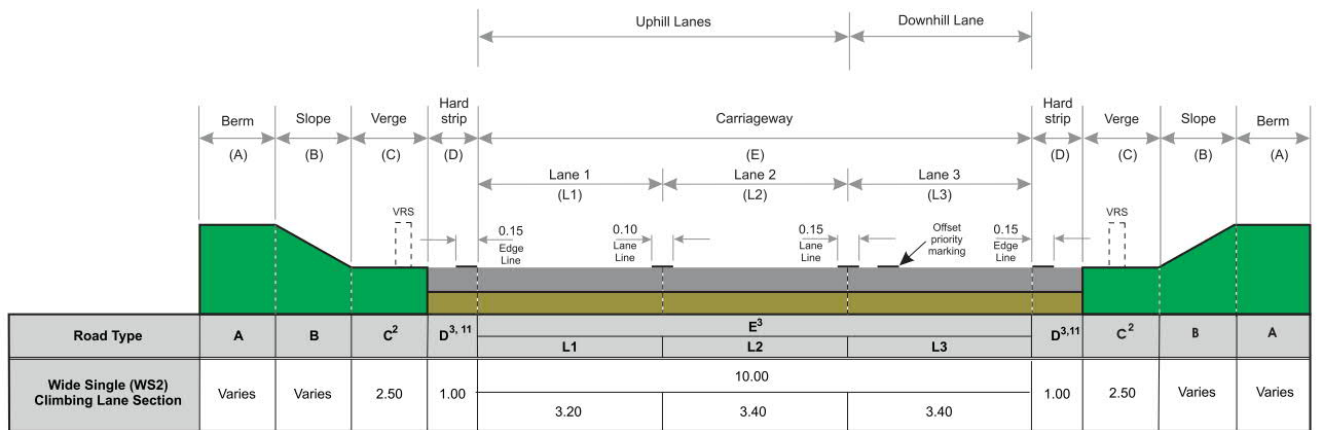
Wide Single Carriageway Climbing Lane Section
